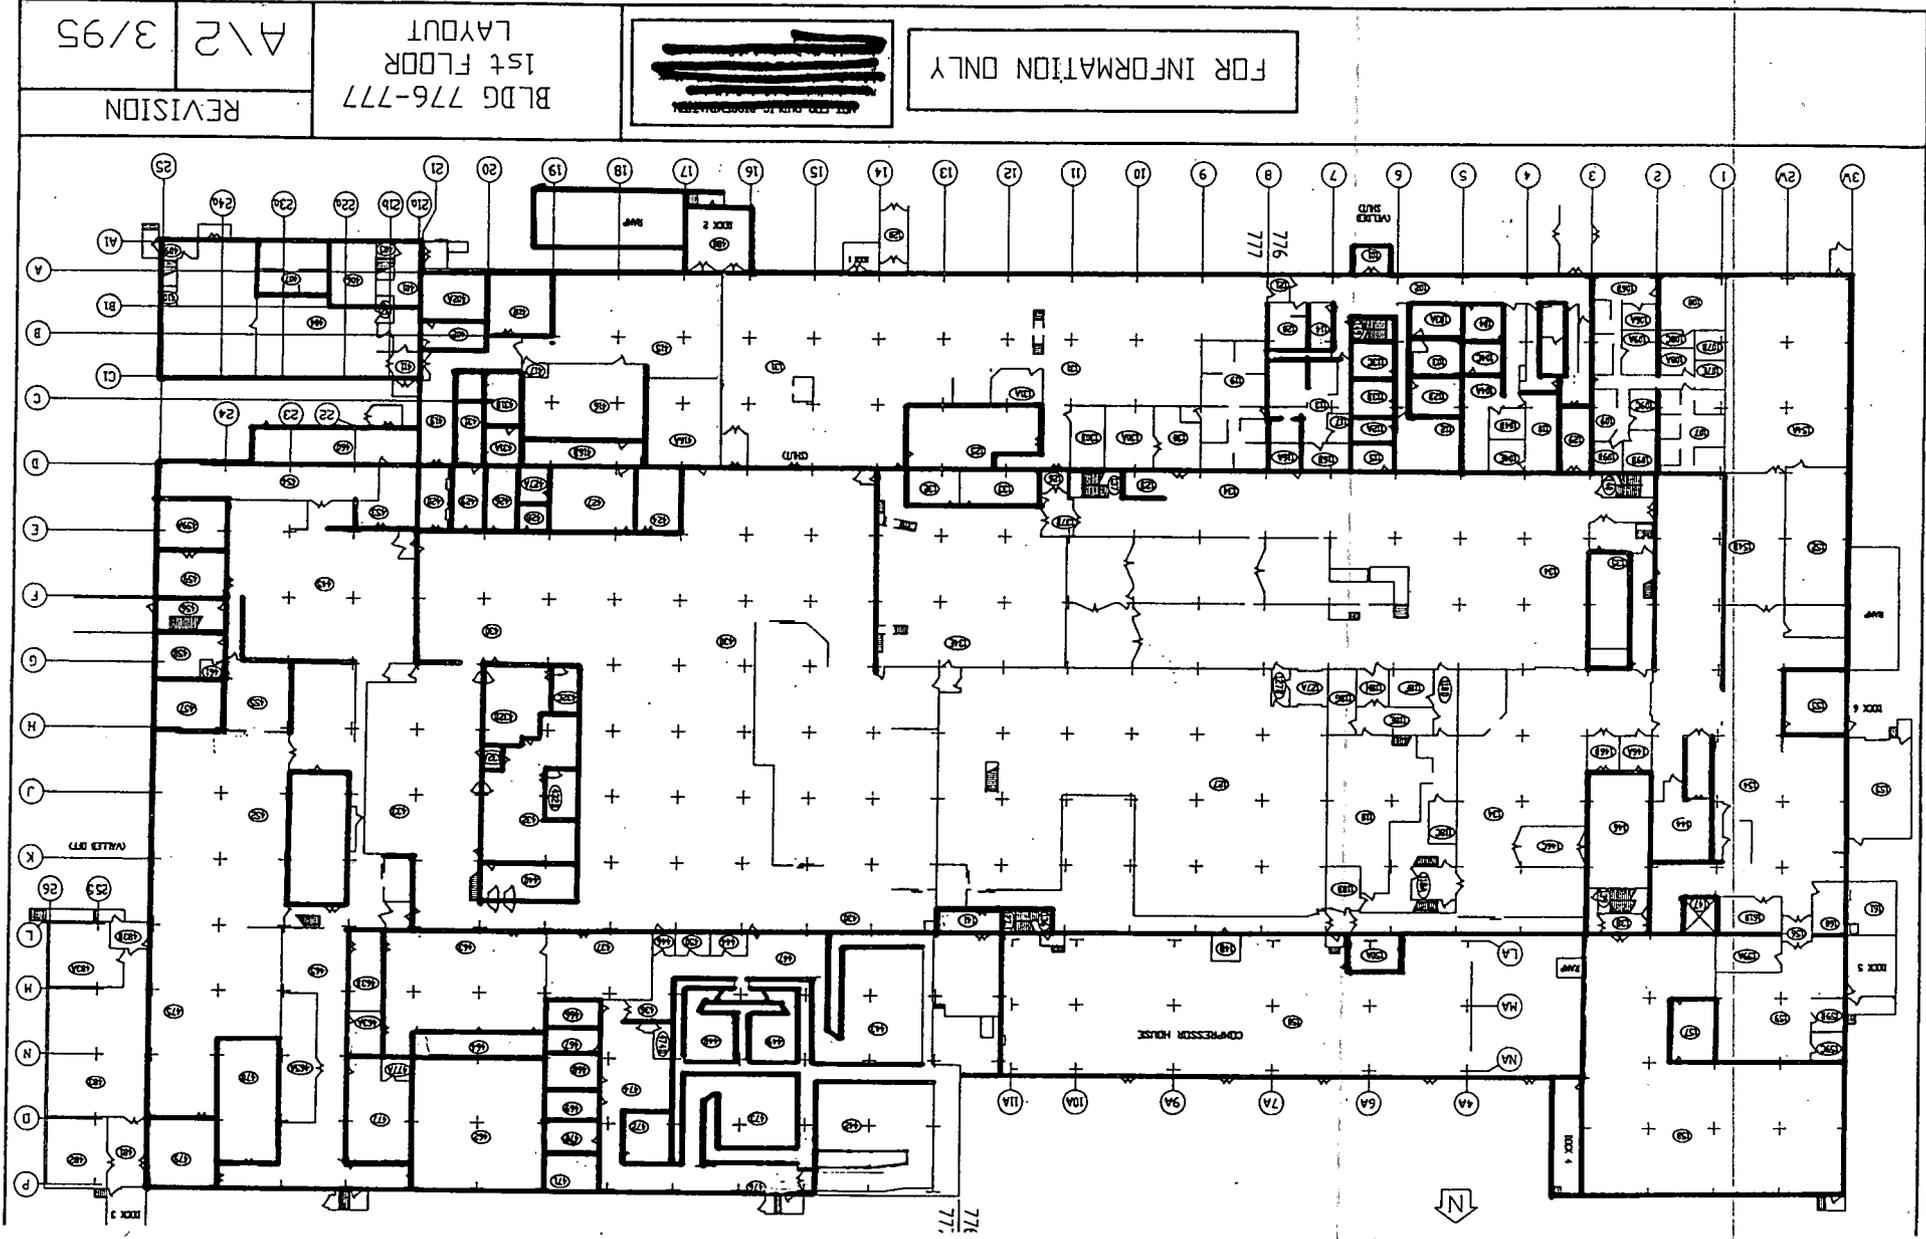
Building 776/777 First Floor Walls Present During the 1969 Plutonium Fire
